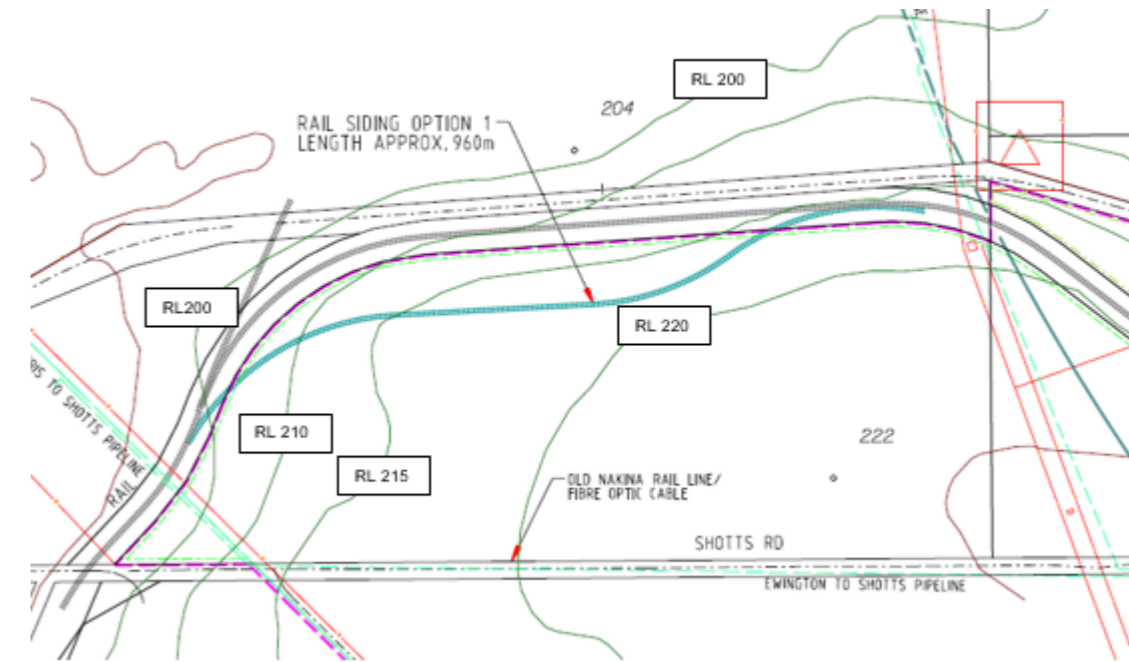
Rail Siding Option 1 Wood & Grieve (2008)
